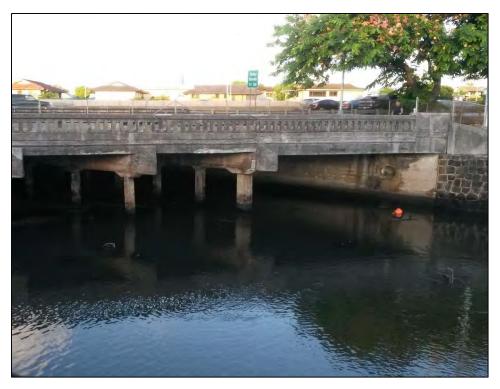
SIHP # -7807, Halona Street Bridge, view to southwest
